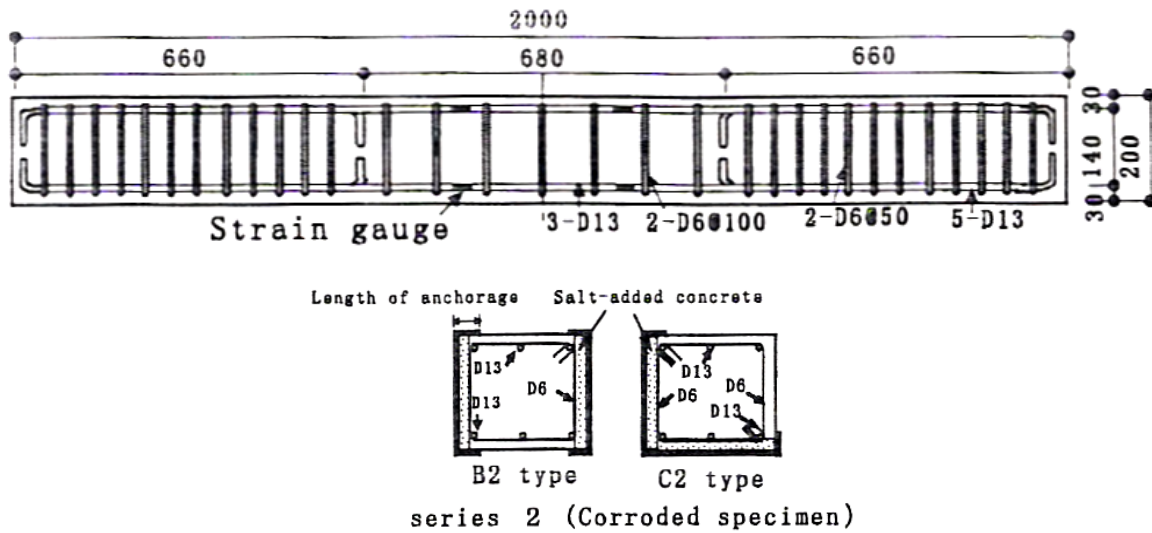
Beam Elevation and Cross Section Kage et al. (1997)
